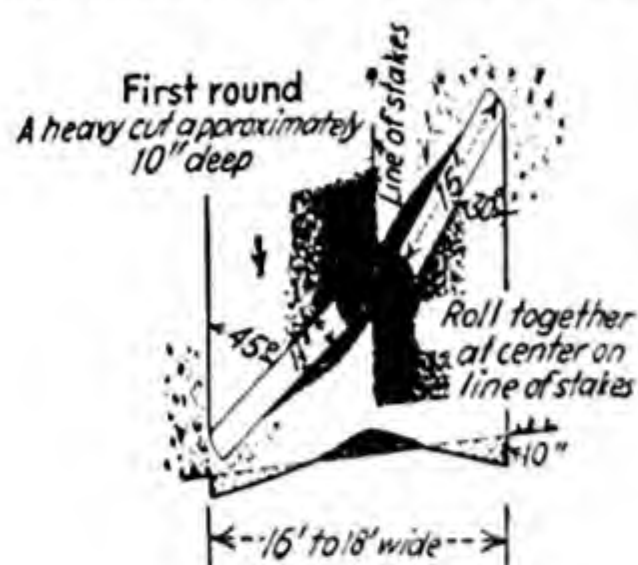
Angle of blade and cut for the first three rounds in constructing terrace with a road machine.
